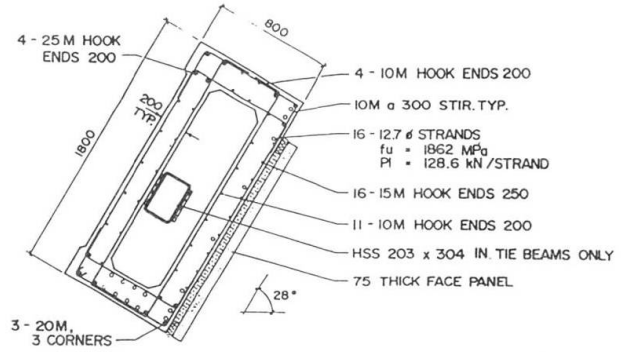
TYPICAL PRECAST CONCRETE PERIMETER BEAM
